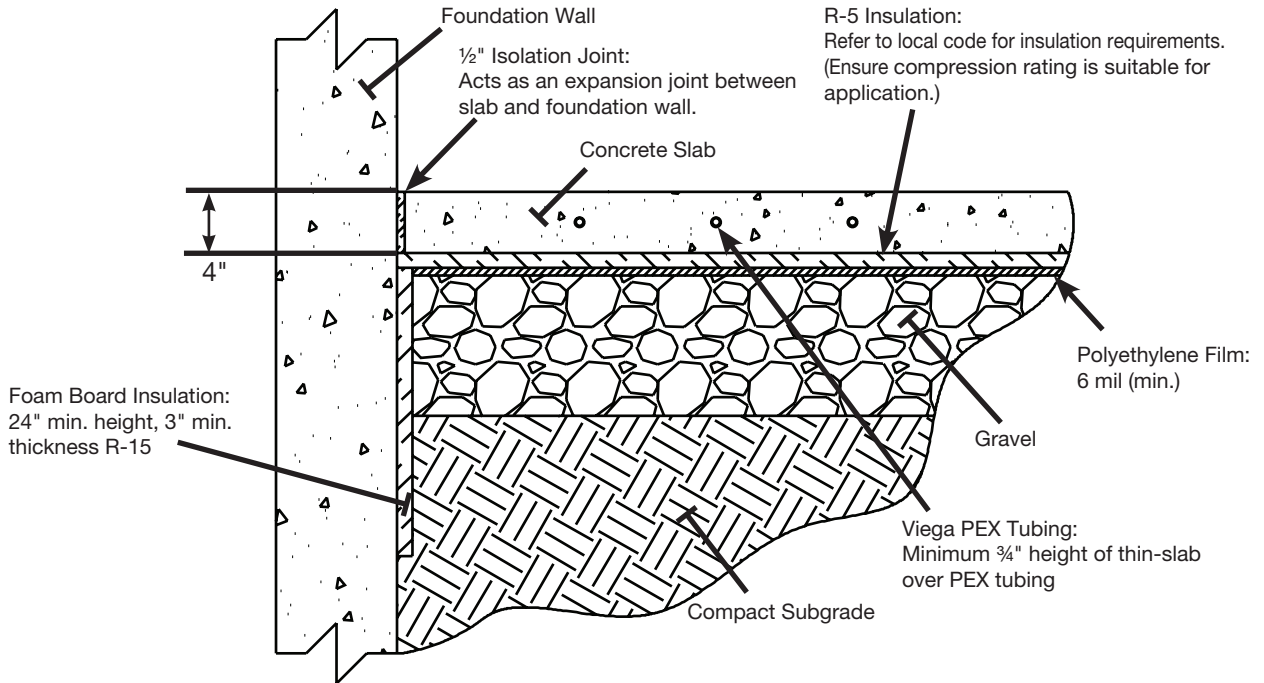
Foam board insulation serves as an expansion joint at the intersection of the slab and concrete foundation, preventing the slab from bonding to the foundation walls
